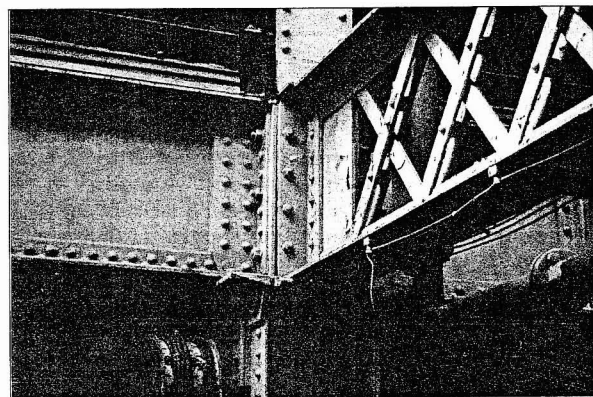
The Market Street Store, Guinness Brewery, Dublin (1904). Detail of the beam-girder connections within the volume of the girders (Alastair Jackson).
